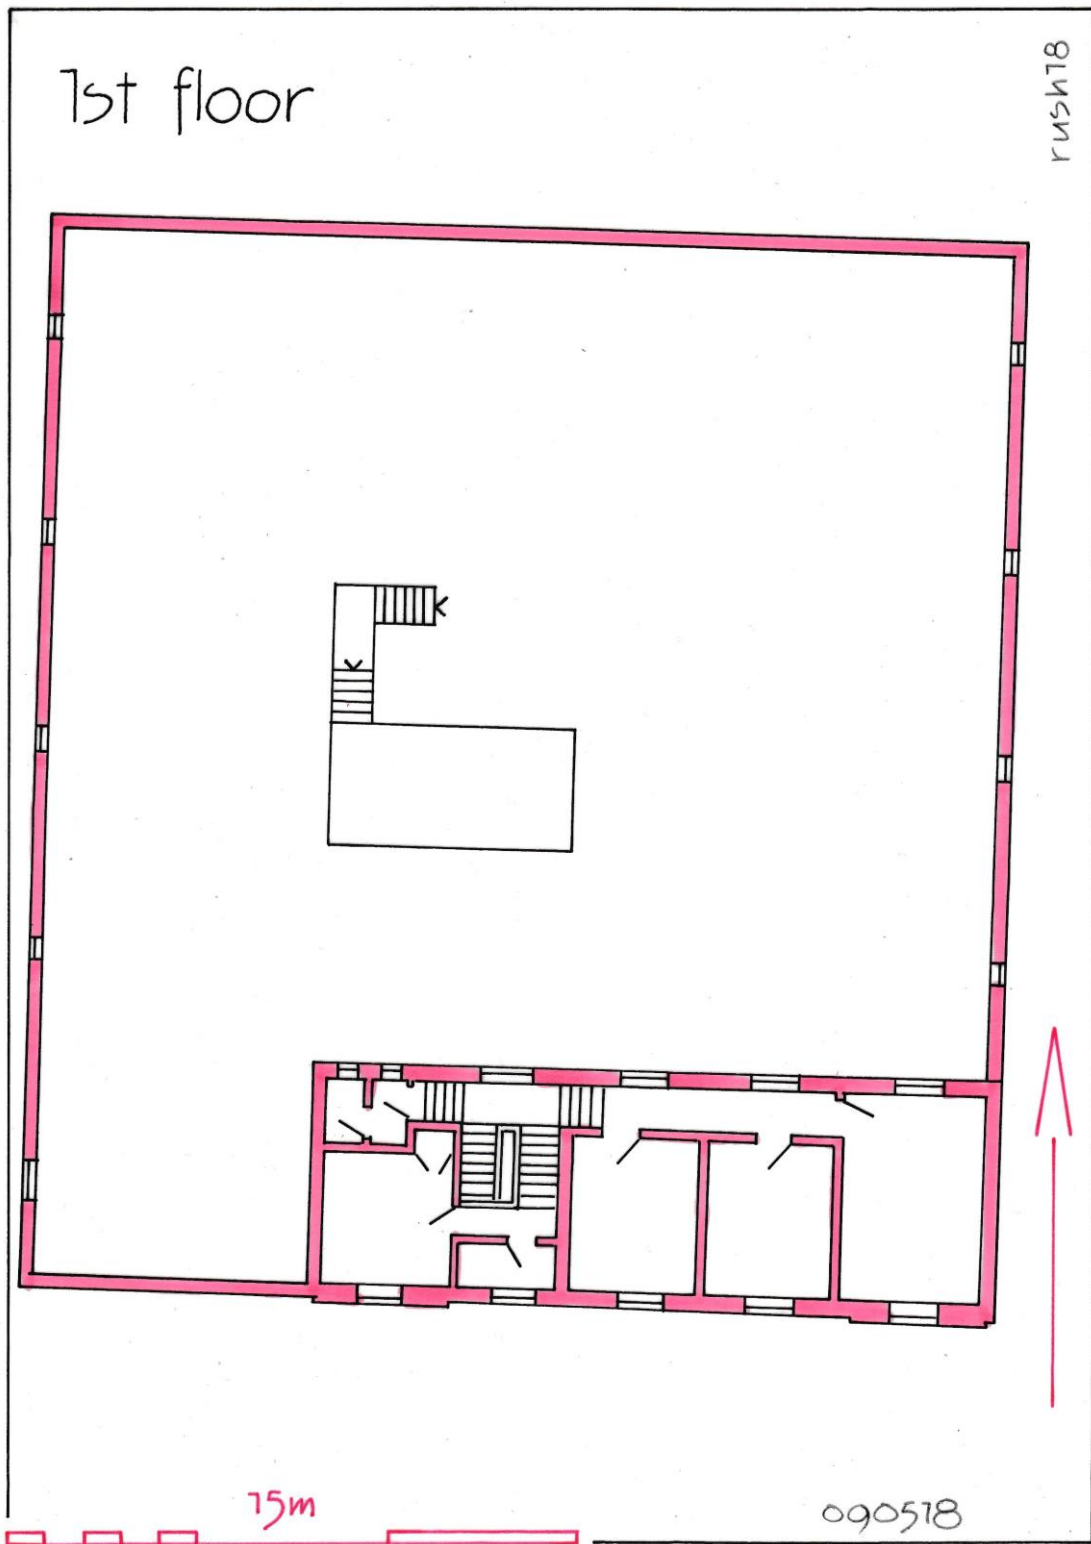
; Factory 1st floor plan, original fabric shown in pink
